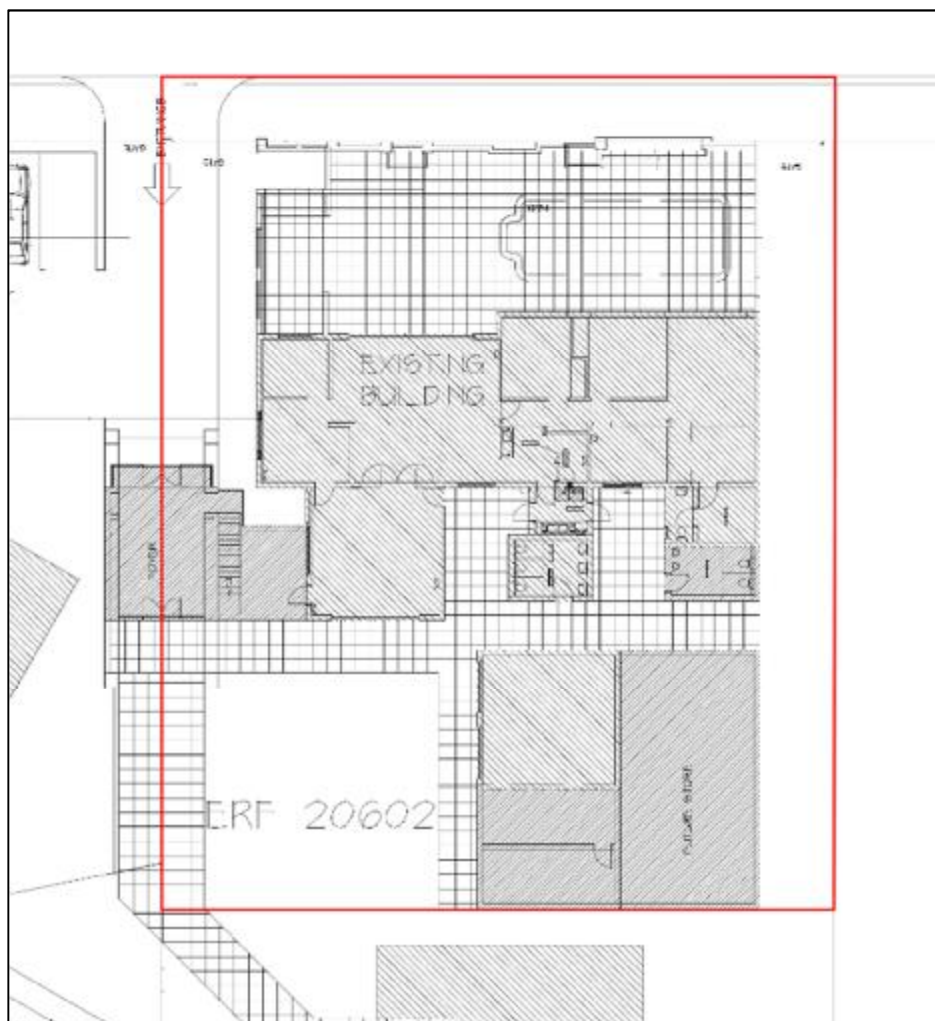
PROPOSED ALTERATIONS ON EXISTING STRUCTURE (ERF 20602)
